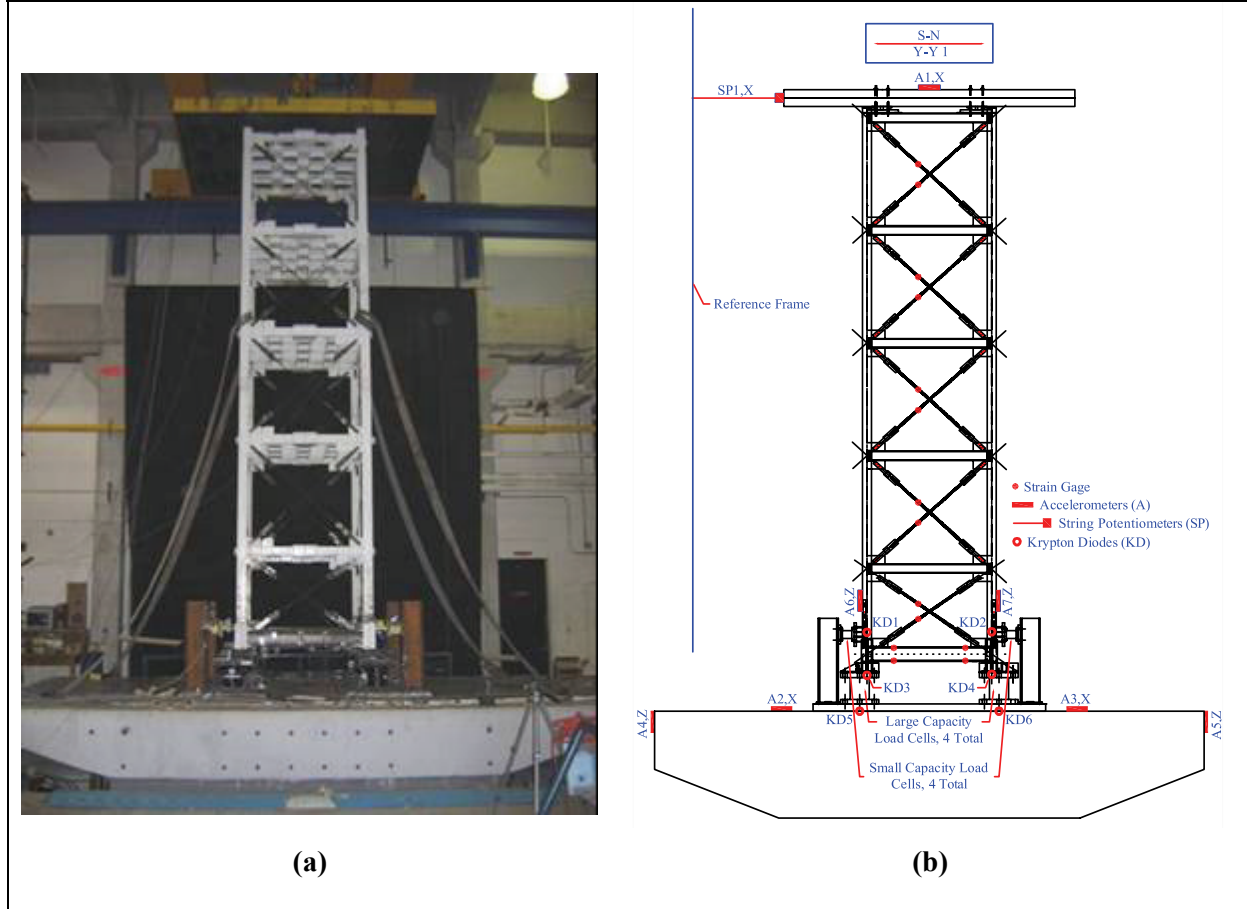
Experimental Pier Specimen (a) Picture of Specimen on Shake Table and (b) Instrumentation Layout
